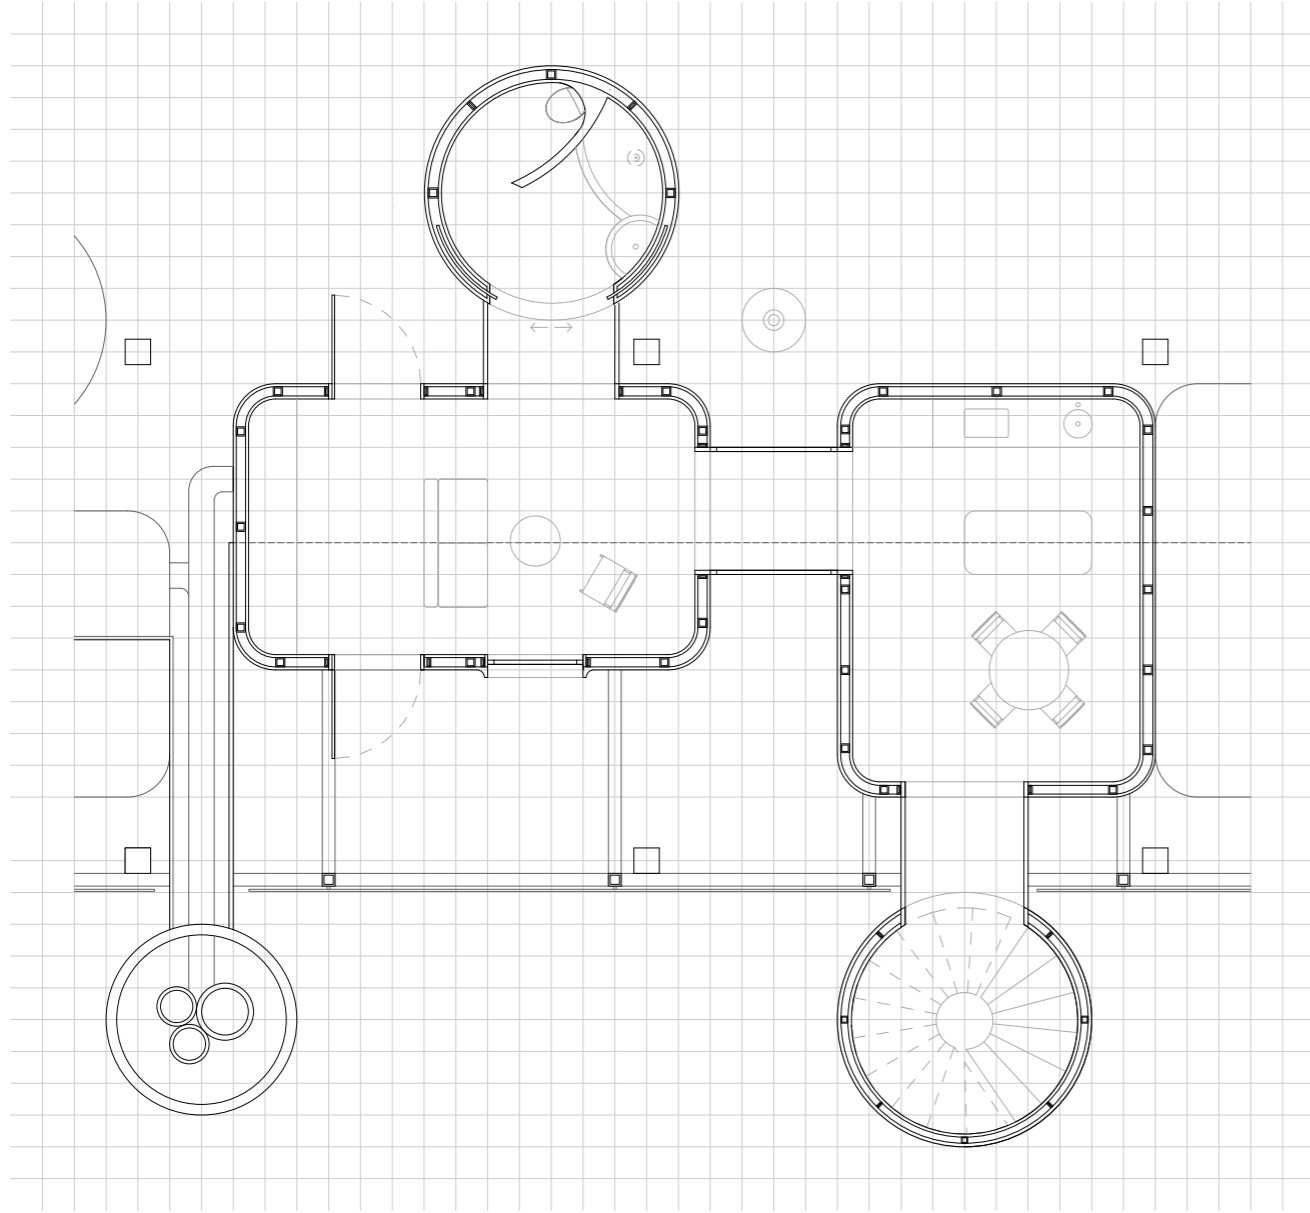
Apartment floor plan, floor 1/2, 1:50
